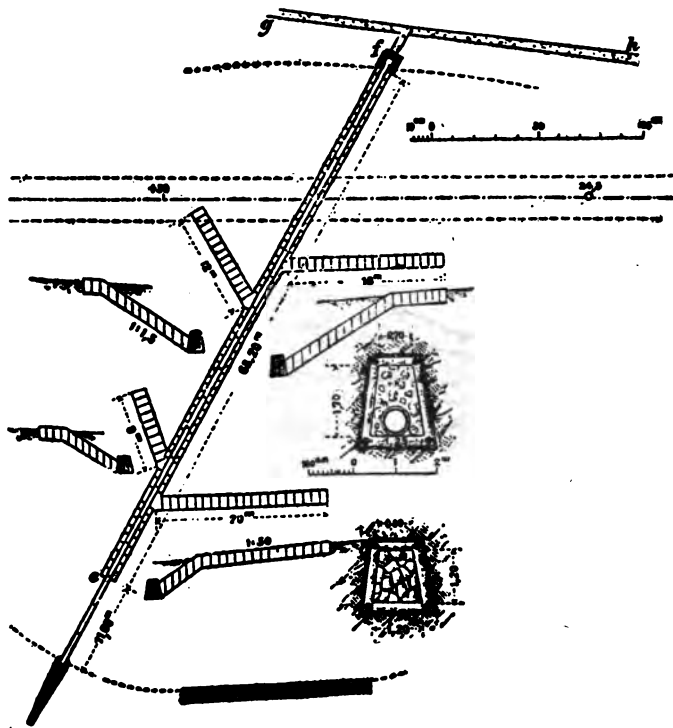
Plan and Sections of Culvert Used on Westerwald Ry.
